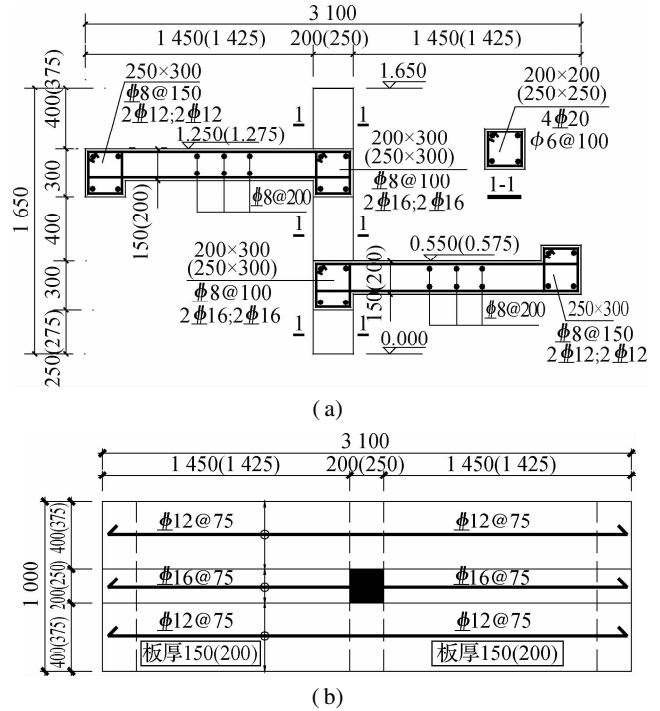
Design parameters of joints(unit: mm). (a) Profile of the specimen; (b) Plan of the specimens
